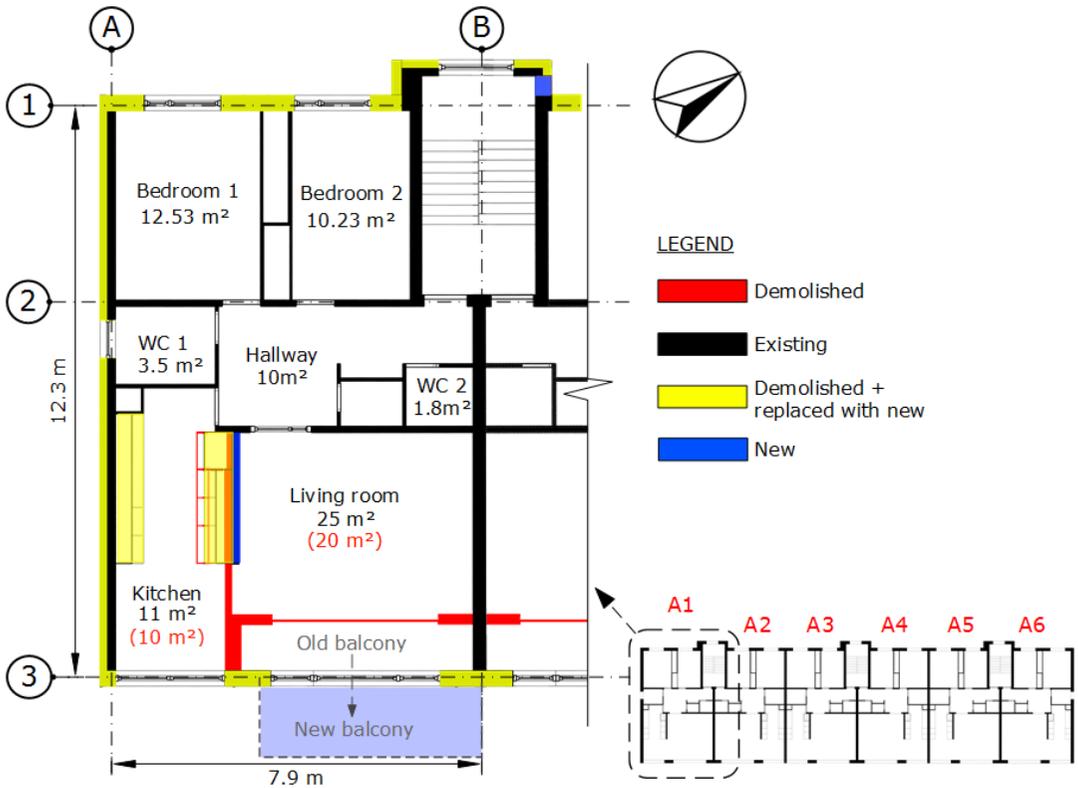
Renovation plan drawing, of apartment A1 including the staircase
